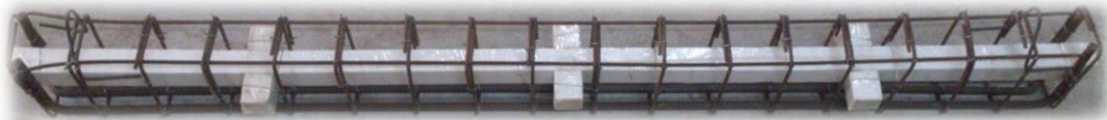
Reinforcing Steel Cage Connected with Opening Molds.
